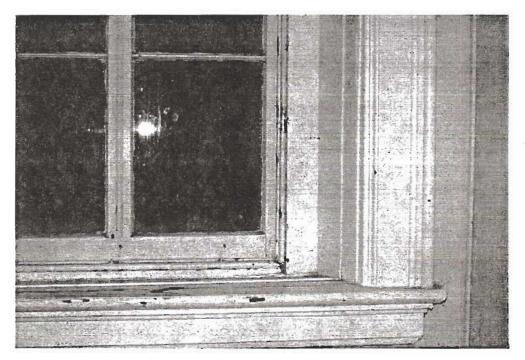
Second Floor Typical Wood Window Surround, Sill and Sash Trim.
